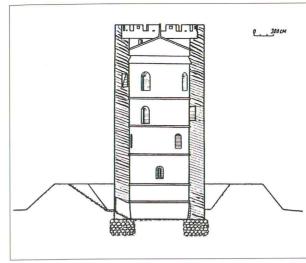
Kamianiec tower (It was built between 1276 and 1288). Cross-section
